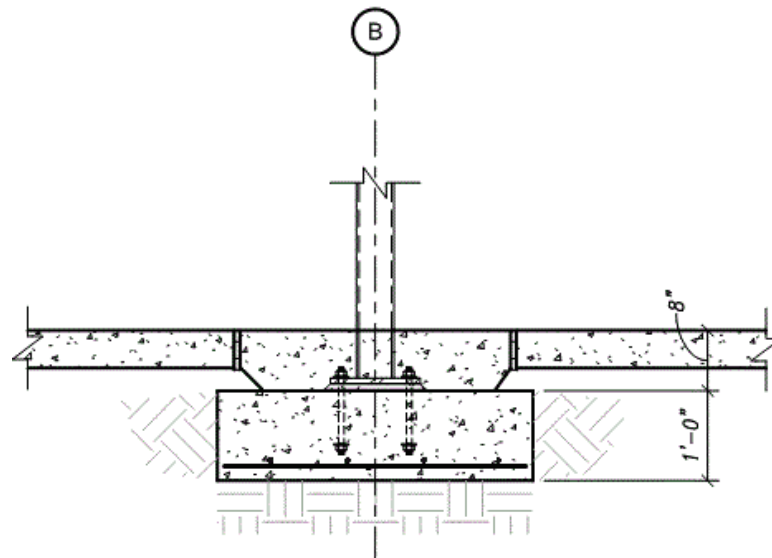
Single-story retail/industrial/warehouse building foundation detail.
